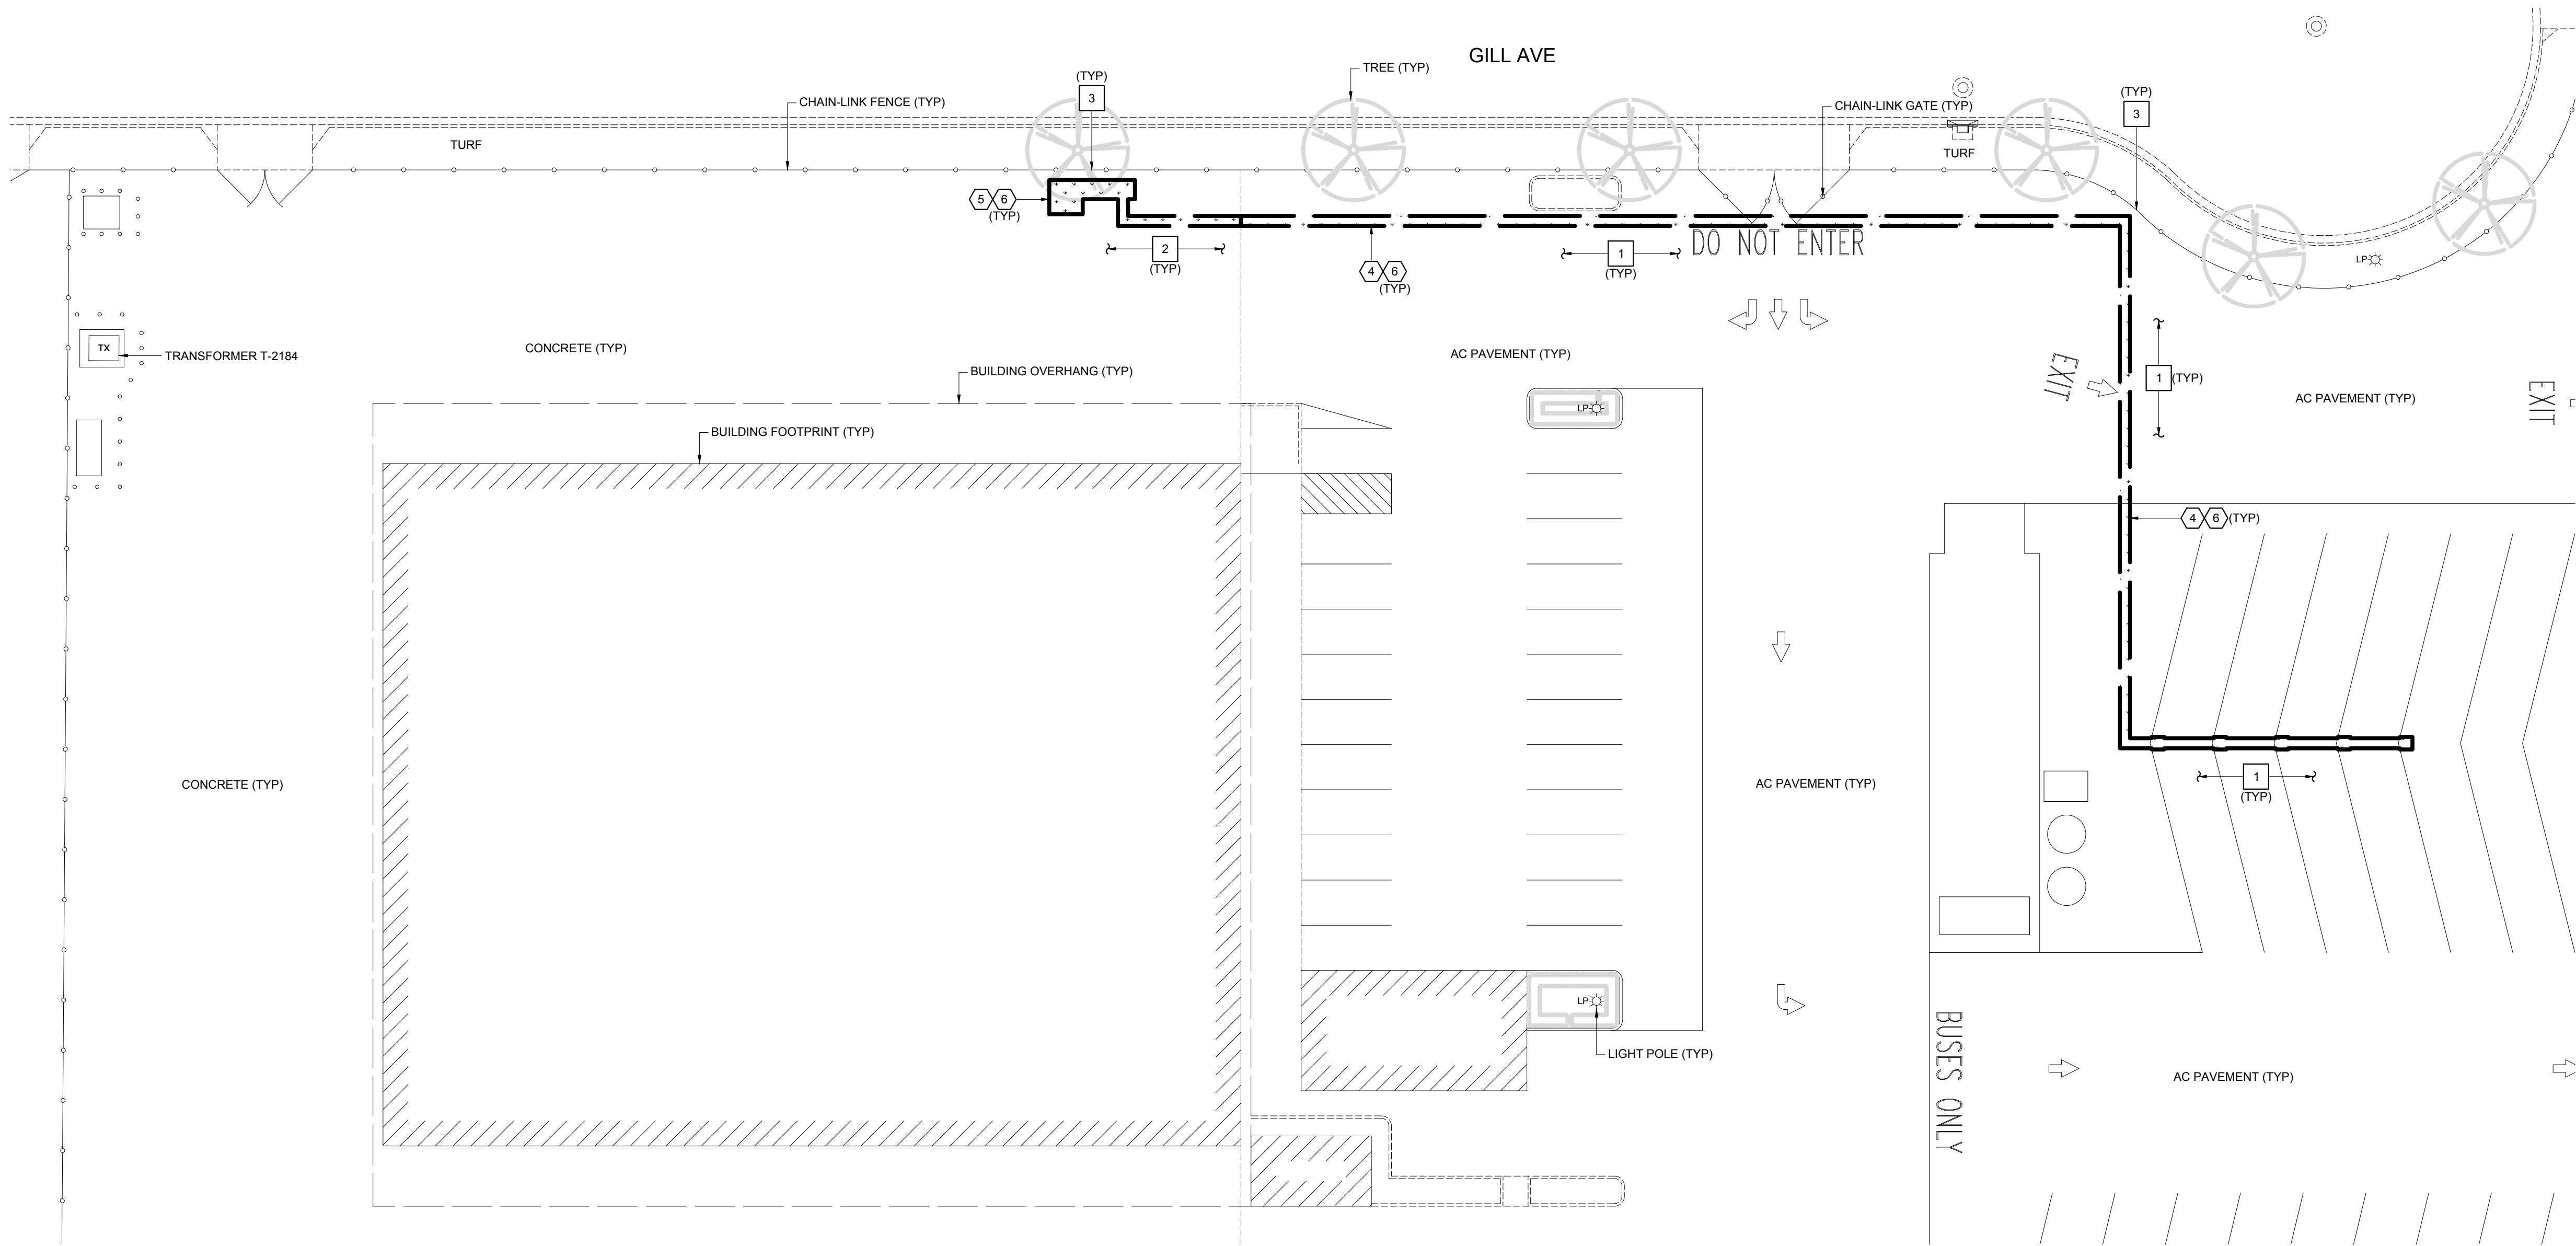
\Madera Unified School District - FLEET\000823710\Products\Drawings\FLEET\000823710\_MUSD\_001.dwg 2 Overall Site Plan - 8/27/20
